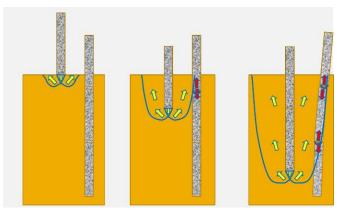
Soil displacing actions at penetrating pile toe to adjacent installed piles
